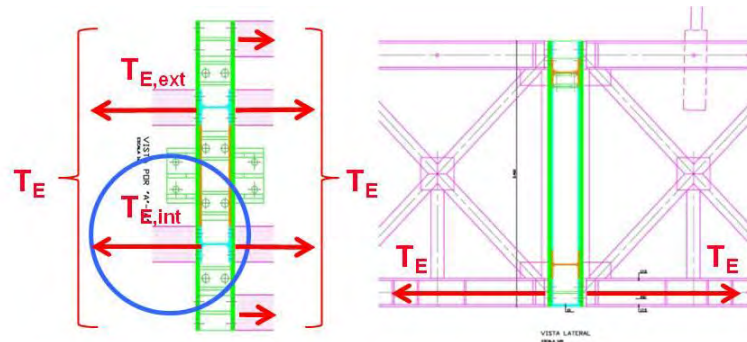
Tensile force transfer at the connection frame (left: plan view, right: elevation)
